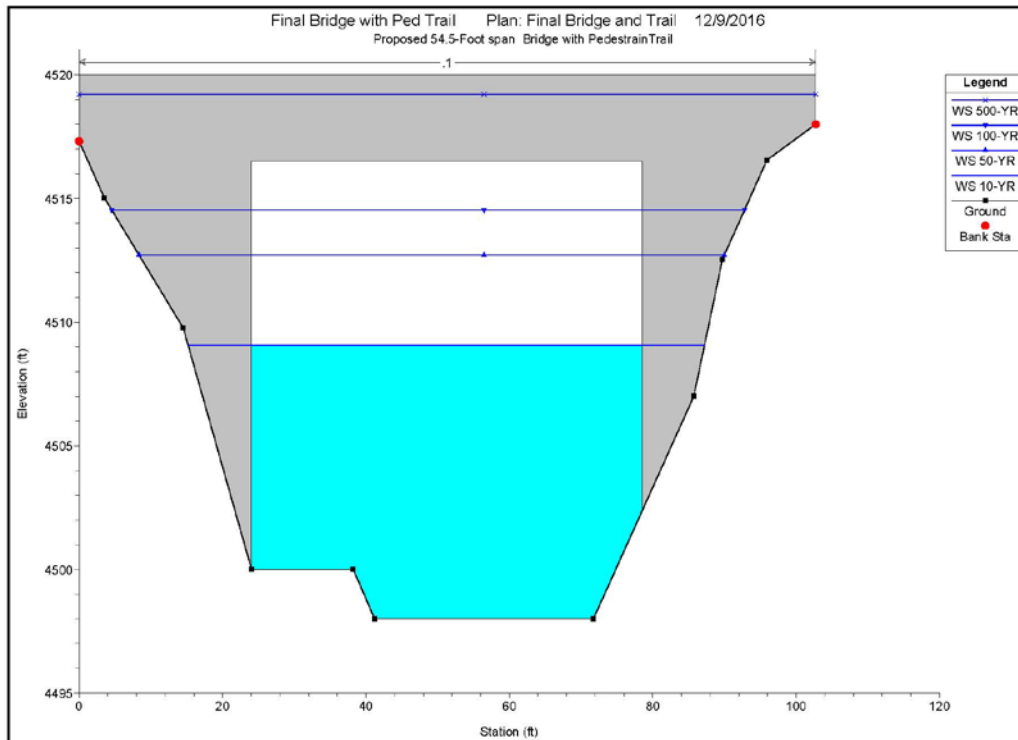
Cross-section of bridge Option 1 at RS 4+00 of the proposed bridge and pedestrian underpass. 100-year WSEL is at 4514.6 feet and lower chord of the proposed bridge deck is at 4516.5 feet for a freeboard of 1.9 feet.
